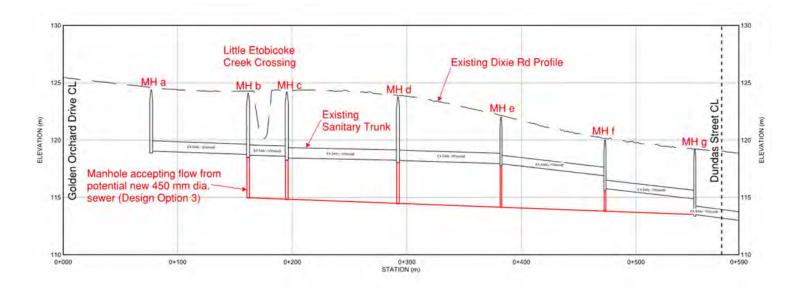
Dixie Road Trunk Sanitary Sewer
